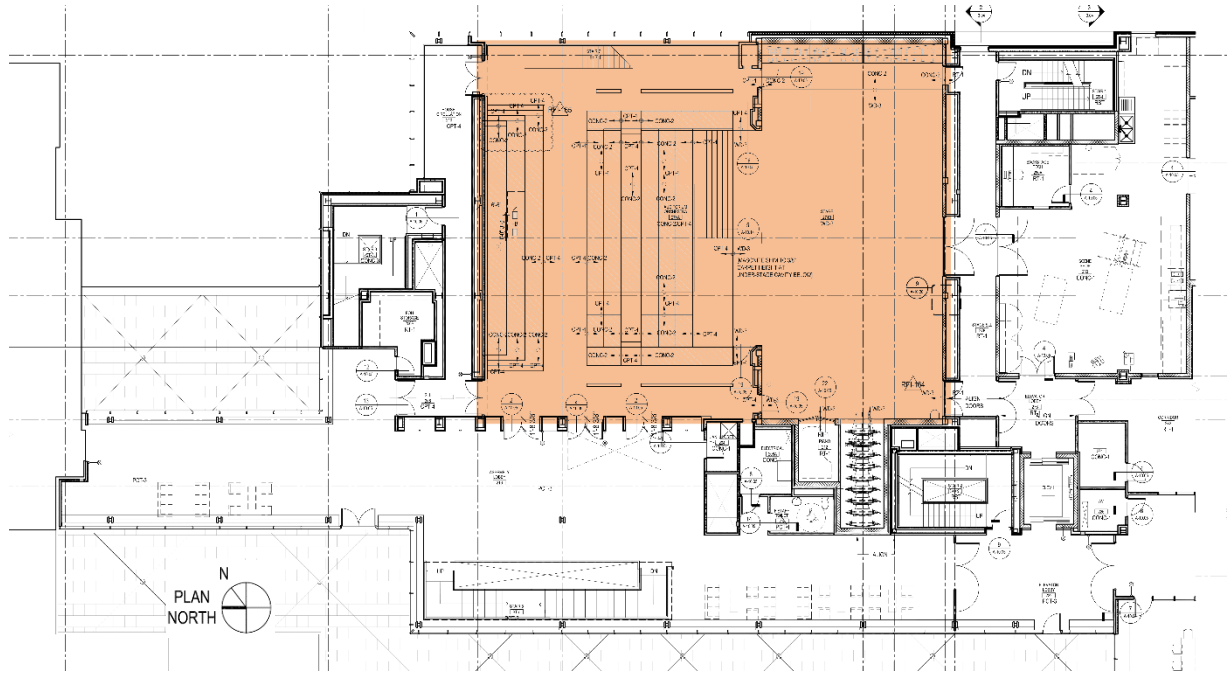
Third Floor "North" Plan – 2 story Theatre
